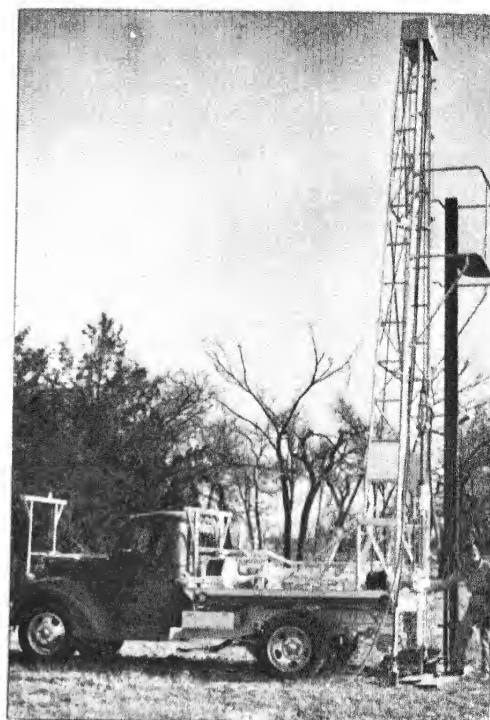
TRUCK MOUNTED ROTARY DRILLING RIG
